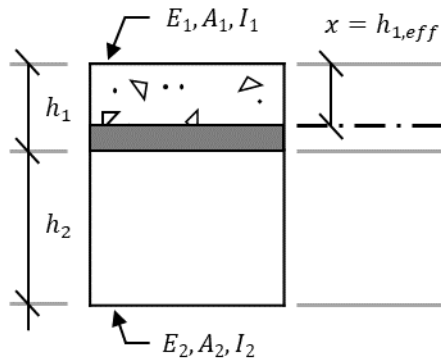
Cross-section of TCC floor with concrete in tension indicated in grey
